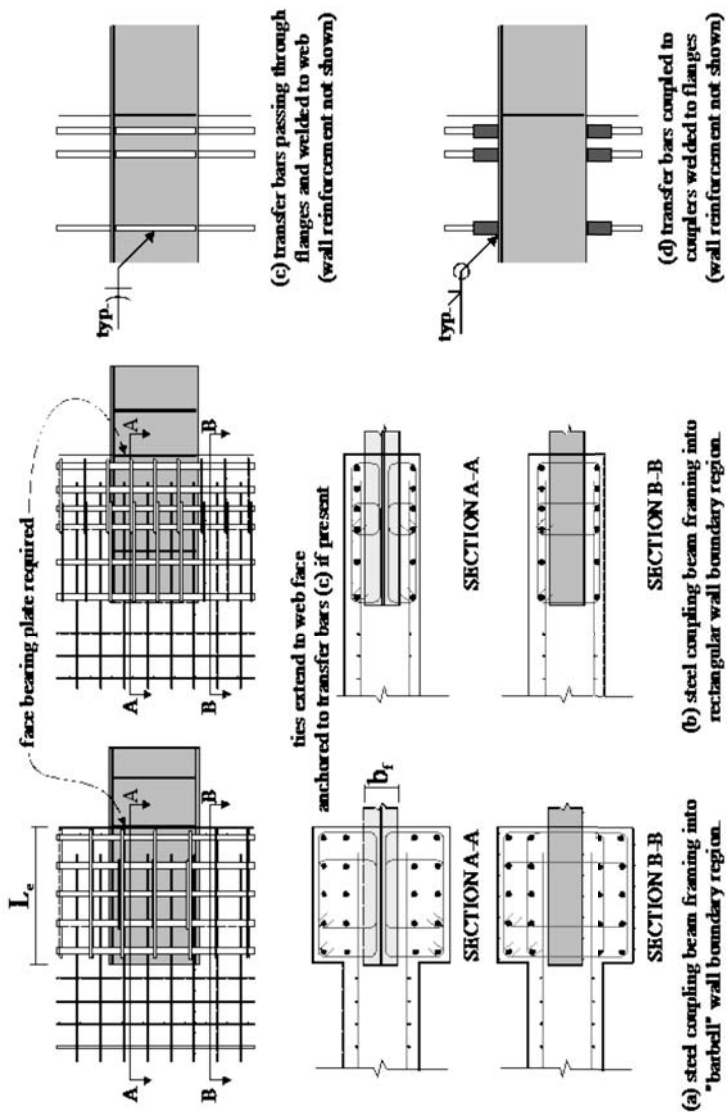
Connection details for HCW systems falling outside the plastic hinge regions of the walls. For those connections in the plastic hinge regions, transverse confinement reinforcement will pass through the coupling beam web.
